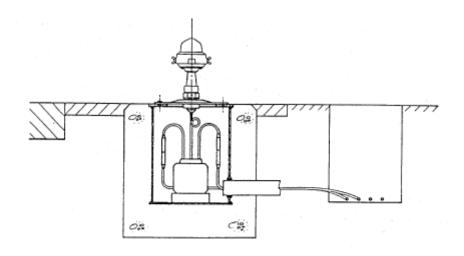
RVE-3-045 mounted on a L-867 base : trench system
